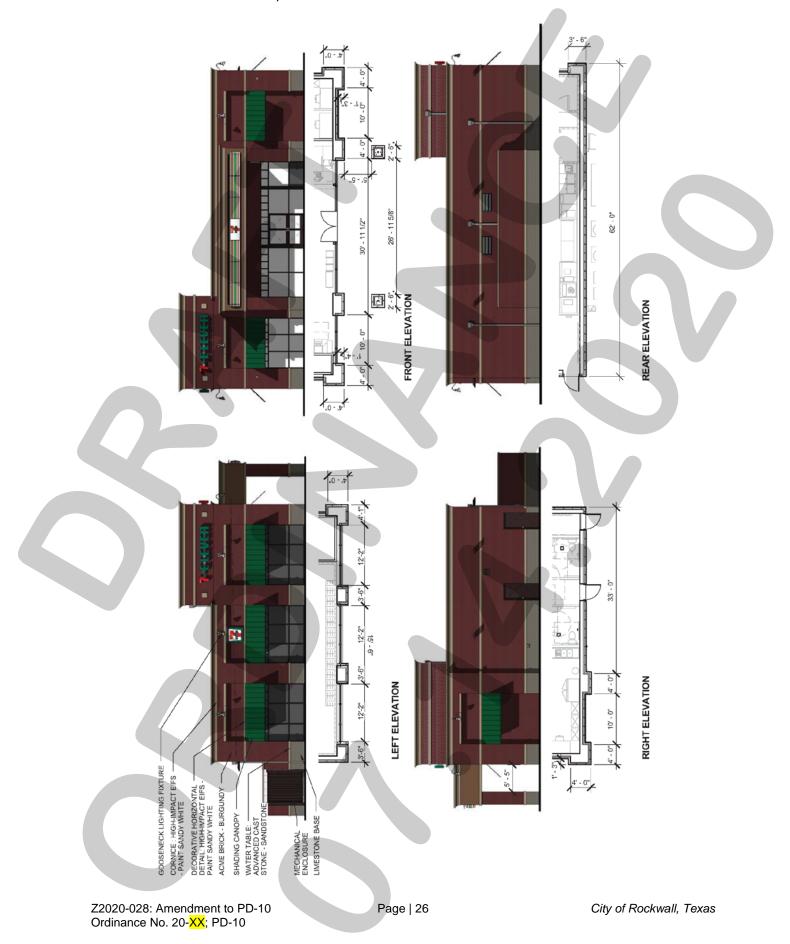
EXHIBIT 'G': Concept Plan and Elevations from Ordinance No. 12-13
